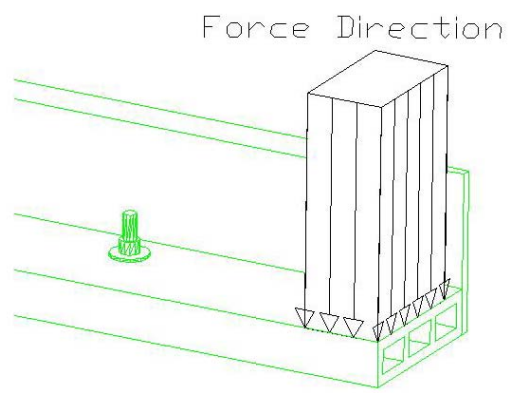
Compressive forces on sill plate from compression chord (end studs) in wall overturning
